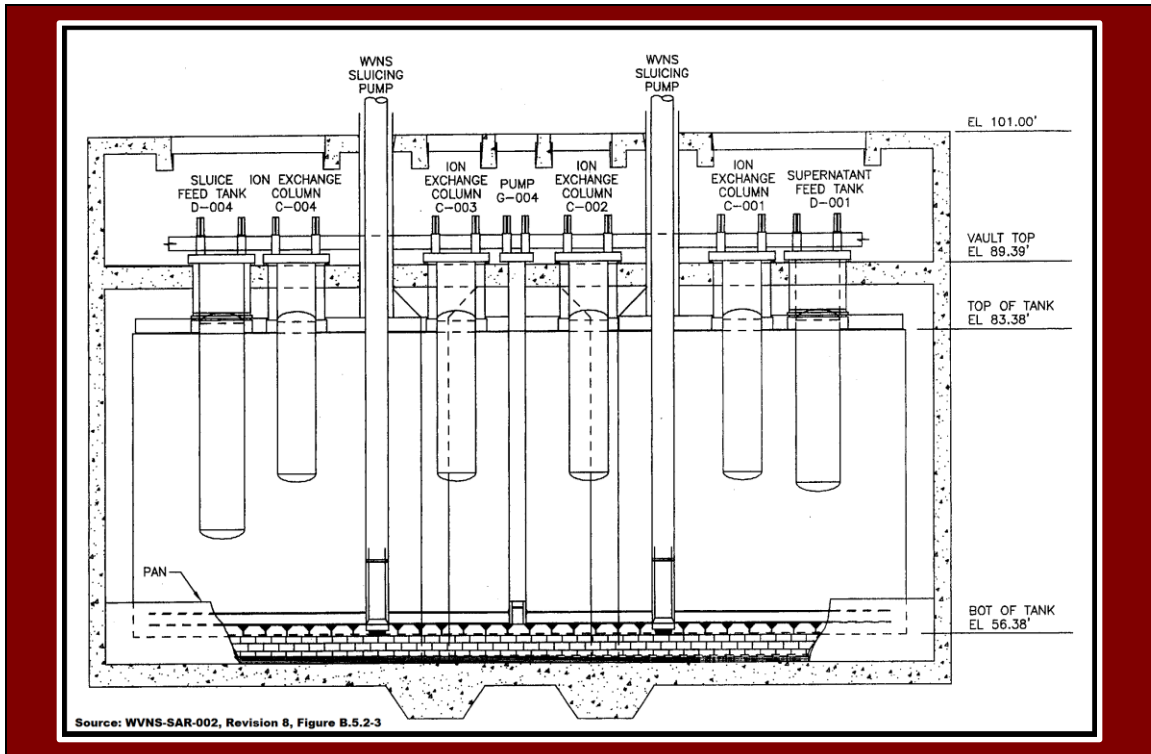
Sectional View of STS Equipment in Tank 8D-1
